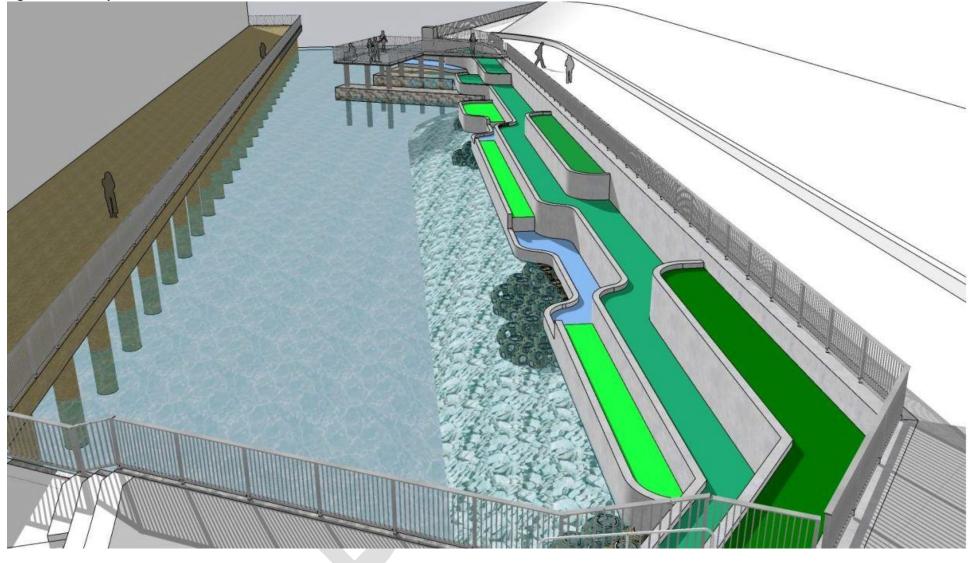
Proposed Pier A Inlet Observation Platform
